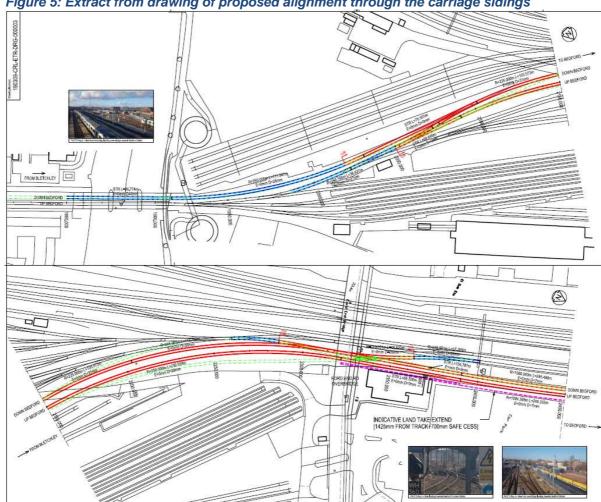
Extract from drawing of proposed alignment through the carriage sidings
